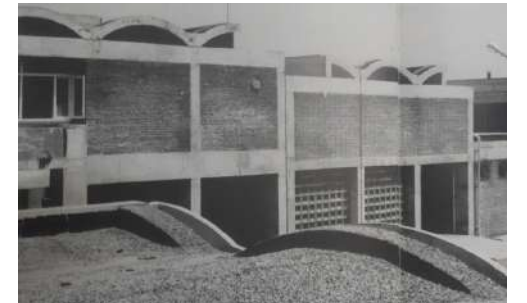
Concrete frame structure with brick and hollow block at the Ammonium Perchlorate Plan
